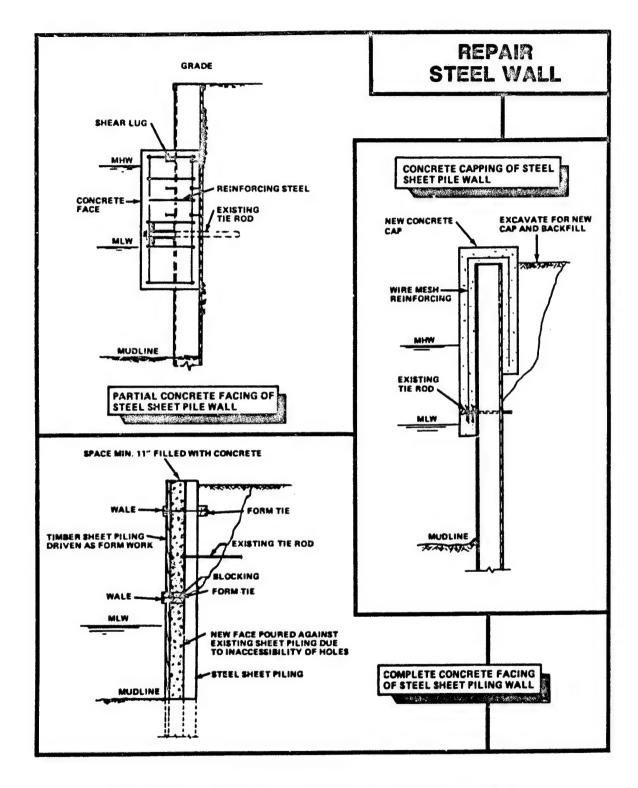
Installing a Concrete Cap and/or Face on a Steel Sheet Piling Wall.
